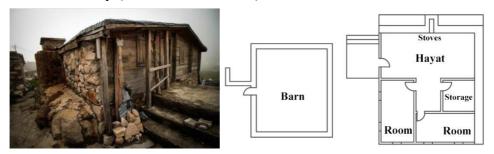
Upper Kavrun Highland Dwellings (Oral, 2024), ground floor and first floor plan (drawn by the author)
